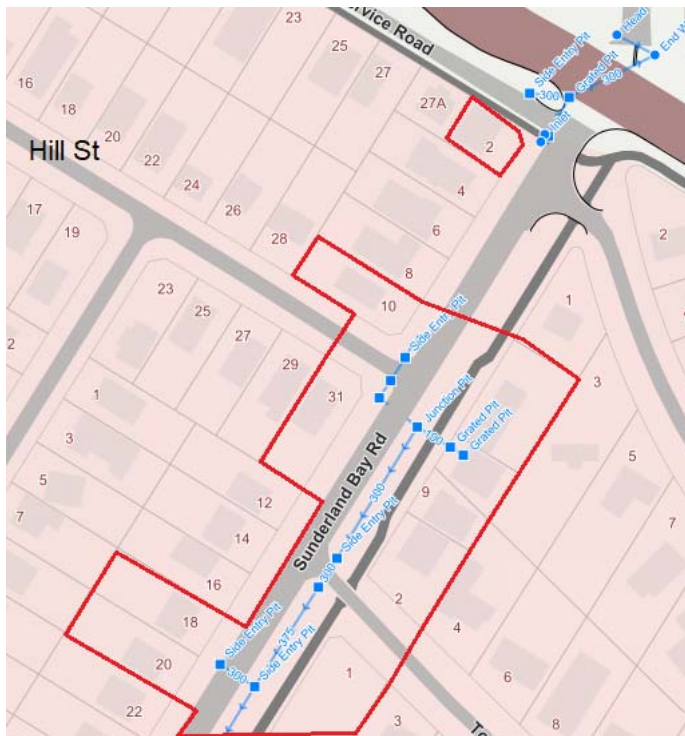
C: Minor existing underground drainage system (Sunderland Bay Rd north end)
